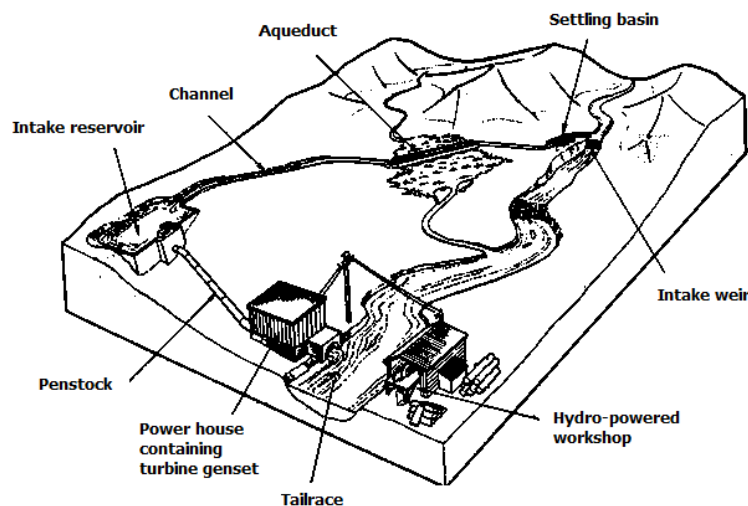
Typical micro hydro-plant layout scheme, adapted from [23]
